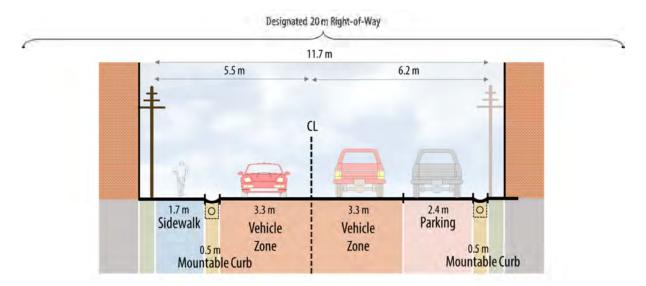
11.7 m Platform Semi-Rural Cross-Section with Sidewalk and Parking for Belfountain Village (Bush St. to Community Centre)
